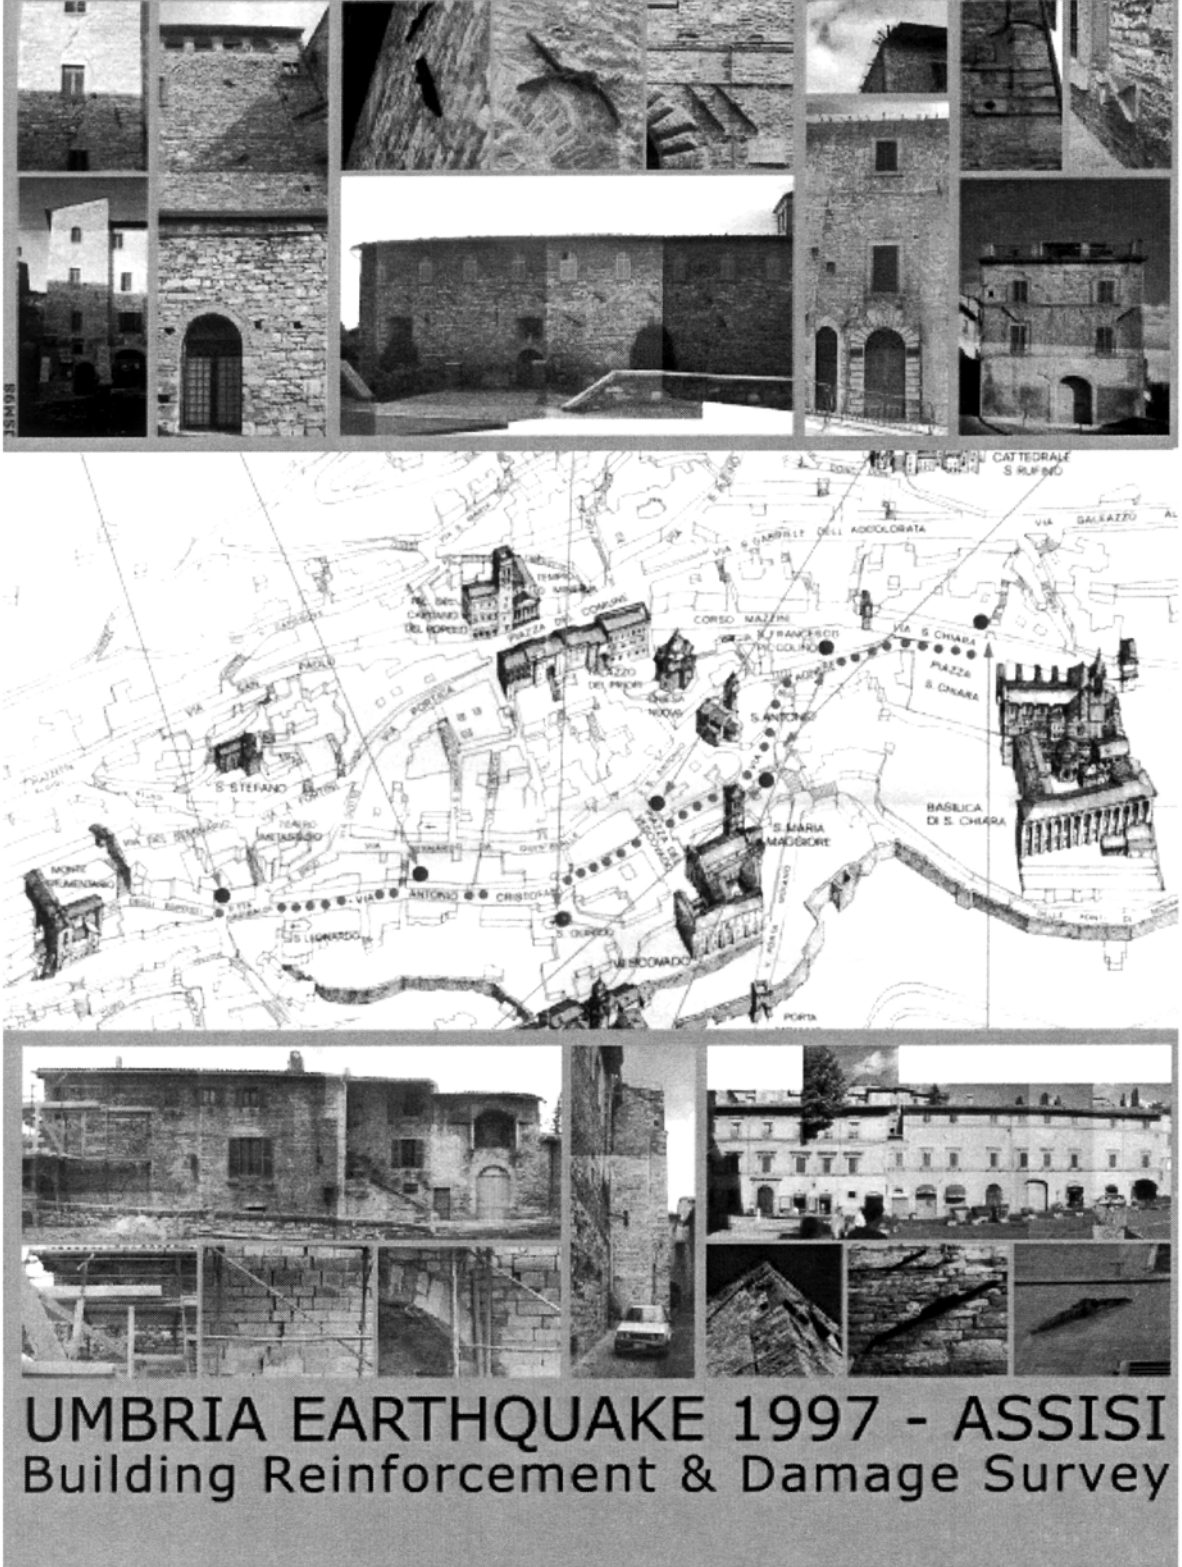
Analysis of building reinforcement and damage survey in Via Cristofani, Assisi
